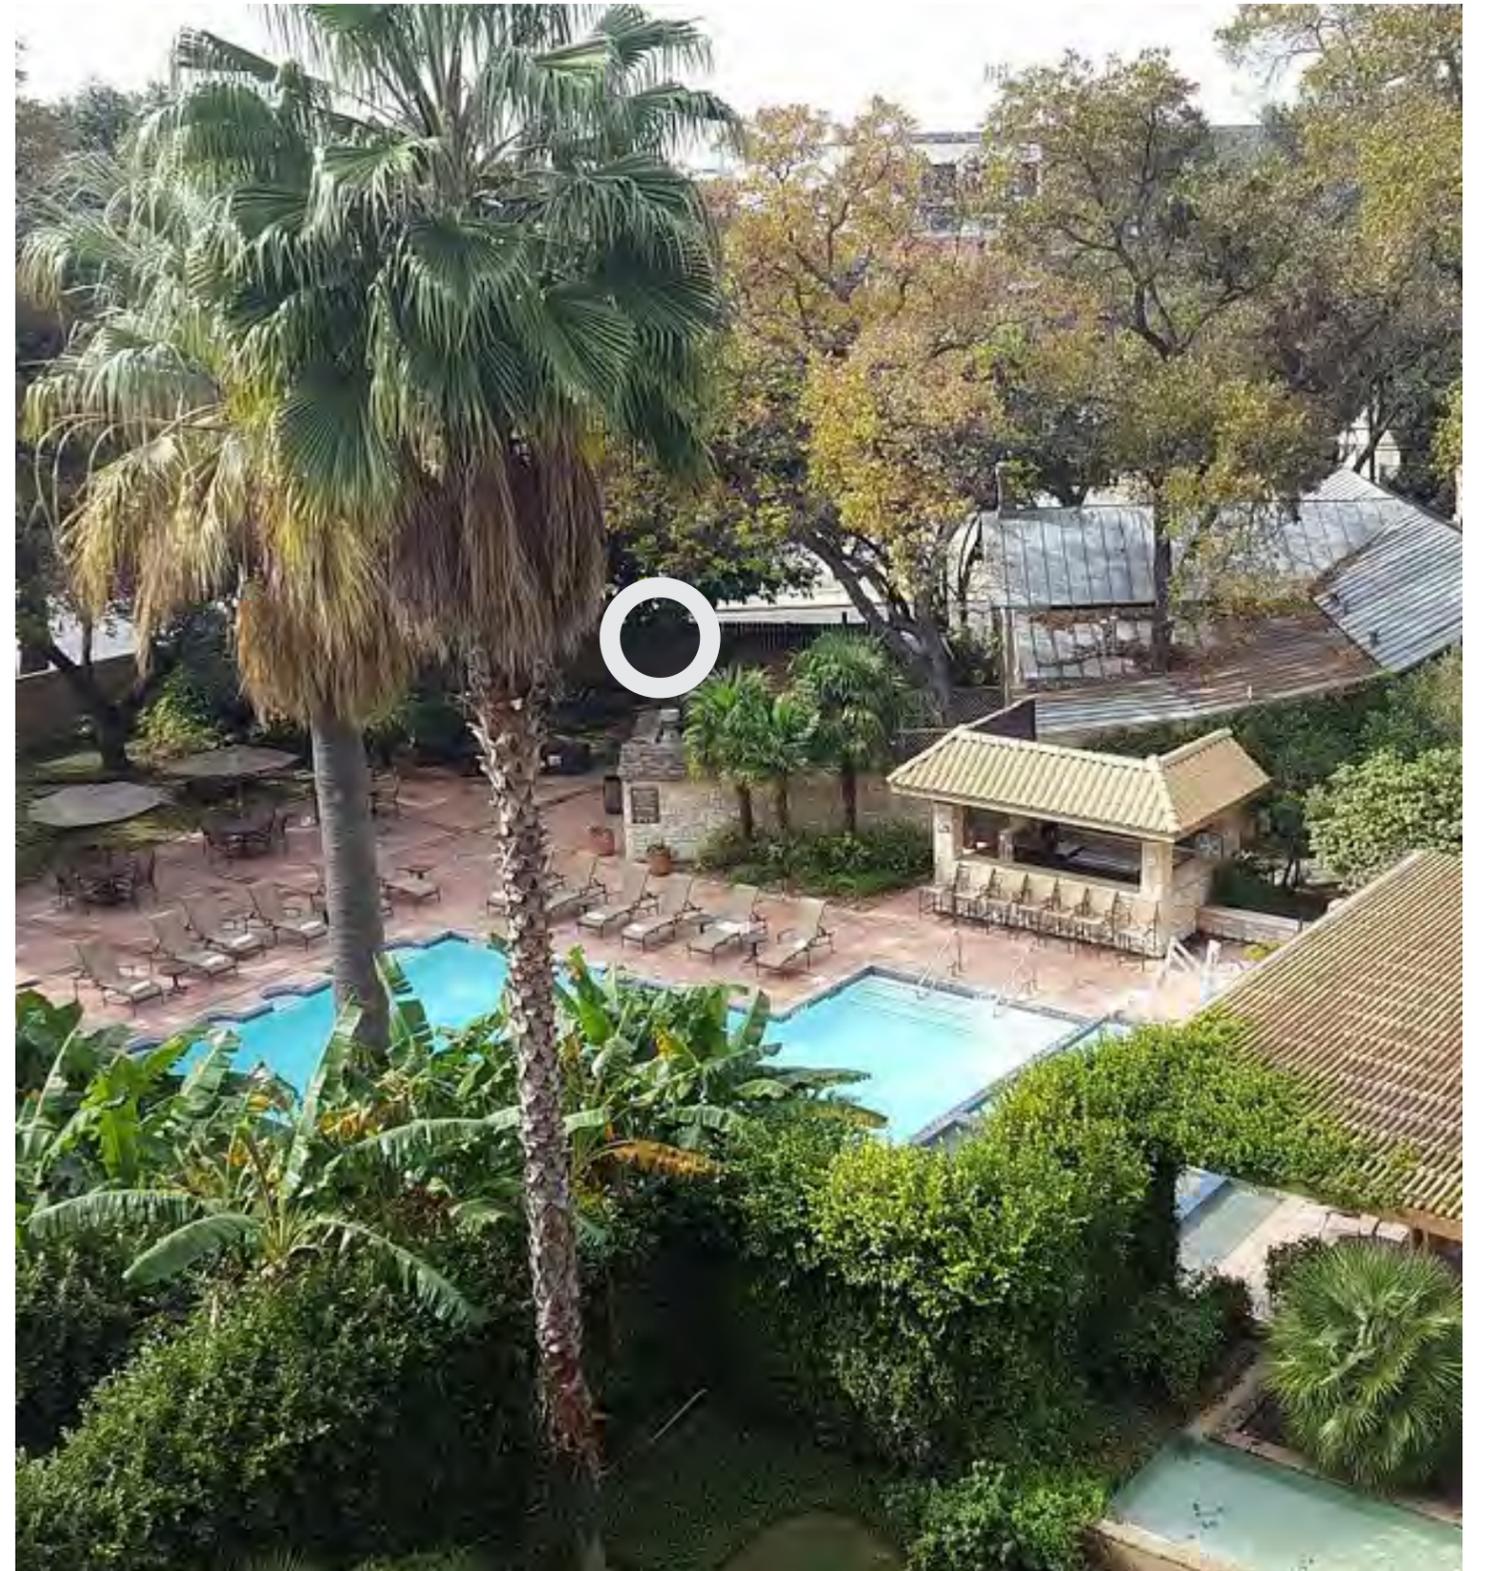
PHOTOS: EXISTING CONDITIONS AT NEW EVENT BUILDING LOCATION
